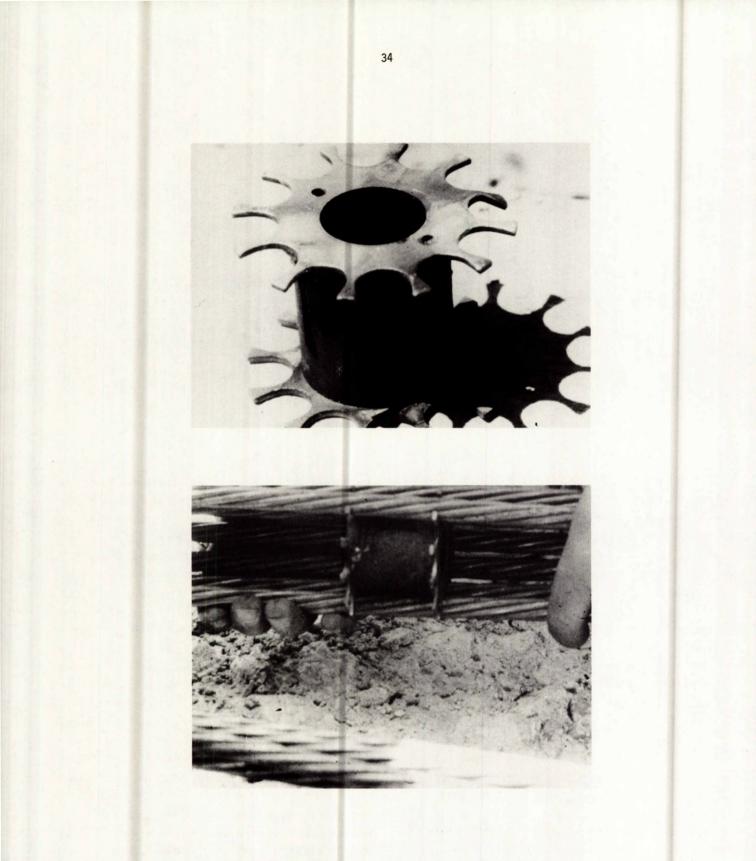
Top: a spacer used in constructing a multi-strand rock anchor. Bottom: strands being assembled around a spacer.
